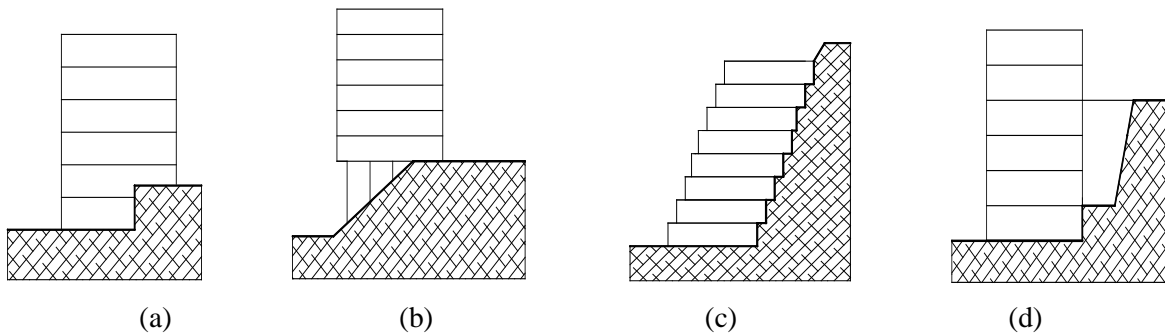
Typical types of structures in mountainous terrain; (a) structure supported by foundations with different elevations; (b) stilted structure on the slope; (c) structure attached on the cliff; (d) structure connected with steep
